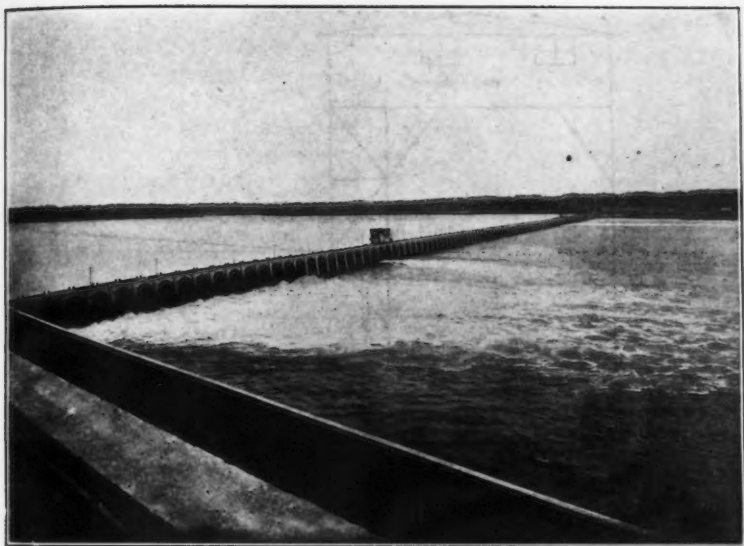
VIEW OF KEOKUK SPILLWAY FROM POWER HOUSE.
